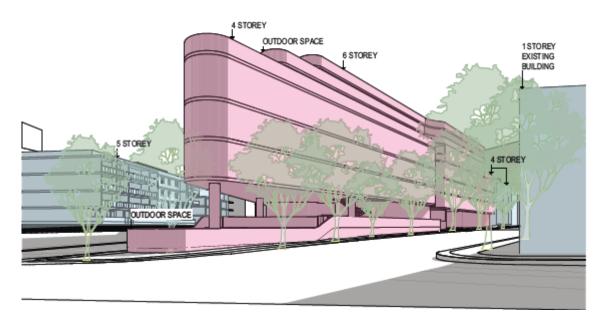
Indicative development concept – view looking north from Young Street. Source: Plus Architecture Urban Design Report
